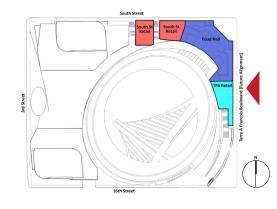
| TERRY A FRANCOIS BOULEVARD RETAIL ELEVATION
